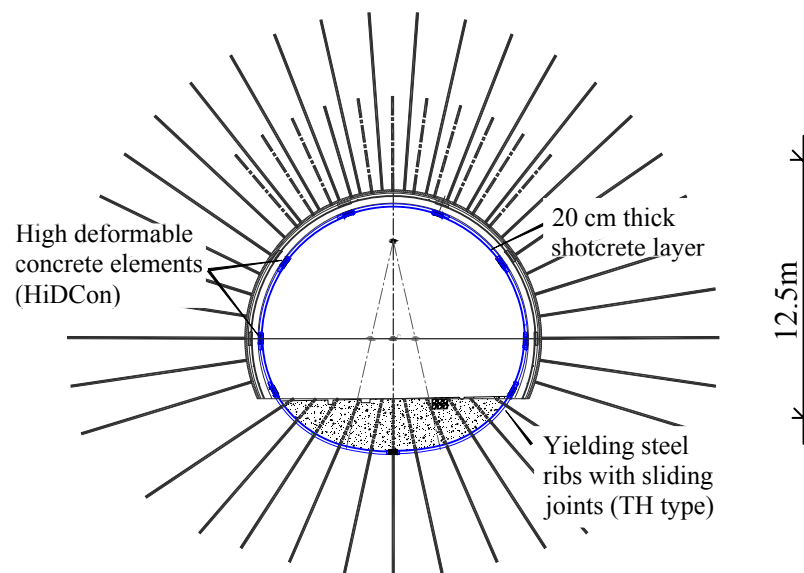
Tunnel cross section showing the excavation-support system DSM adopted between chainage 1400 and 1750 m with the HiDCon elements installed. Note that following chainage 1550 m the number of deformable elements installed was gradually reduced. For sake of simplicity the face pre-reinforcement is not shown.
